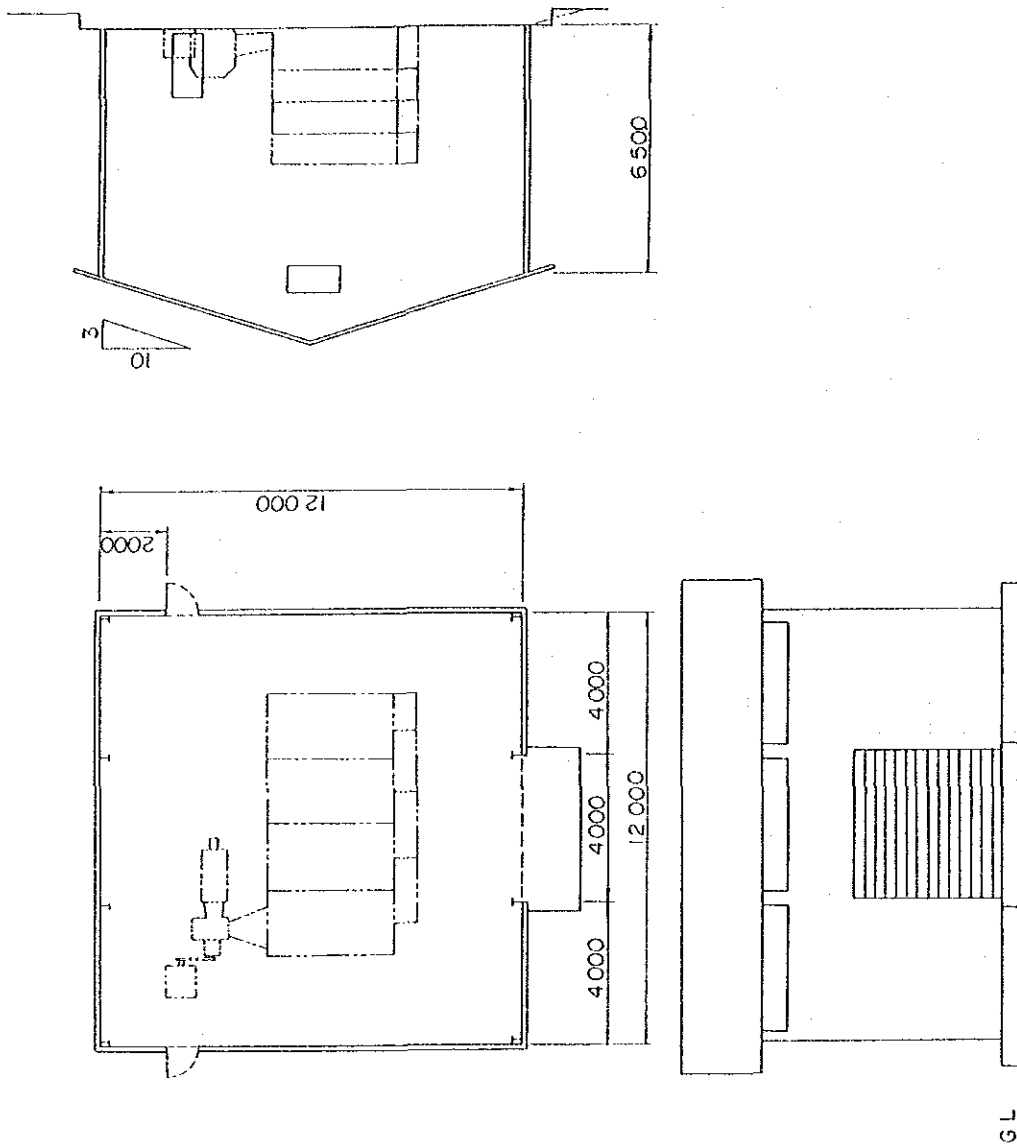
Proposed Cacao Fermentation and Drying Facilities
